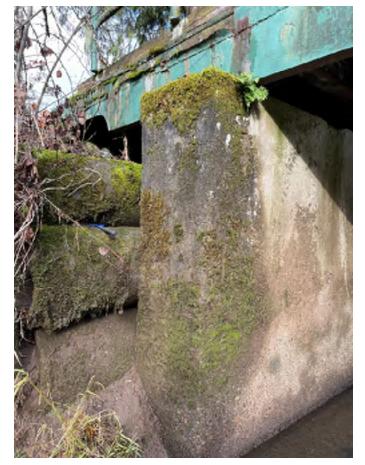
Gordy Jolma No 8 Abutment and Cantilever Railcar section
